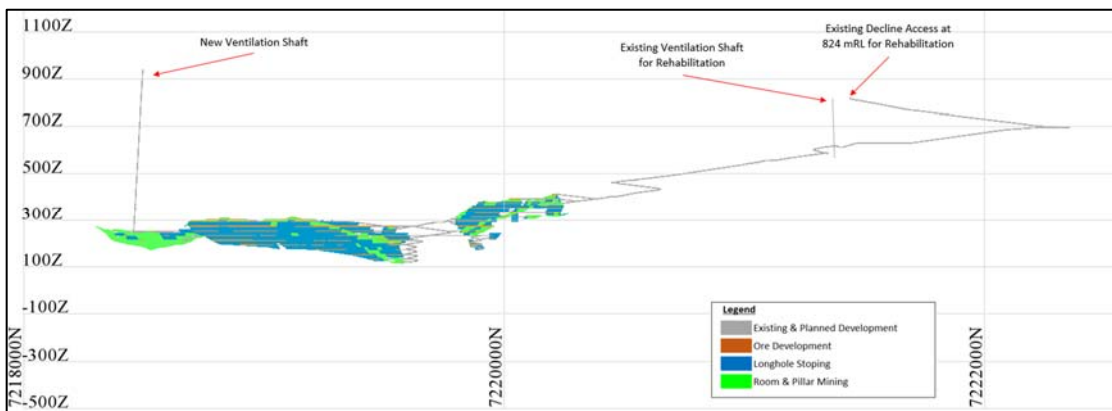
Long view of the Stekenjokk Mining Inventory by mining method and existing and planned development, looking northwest
